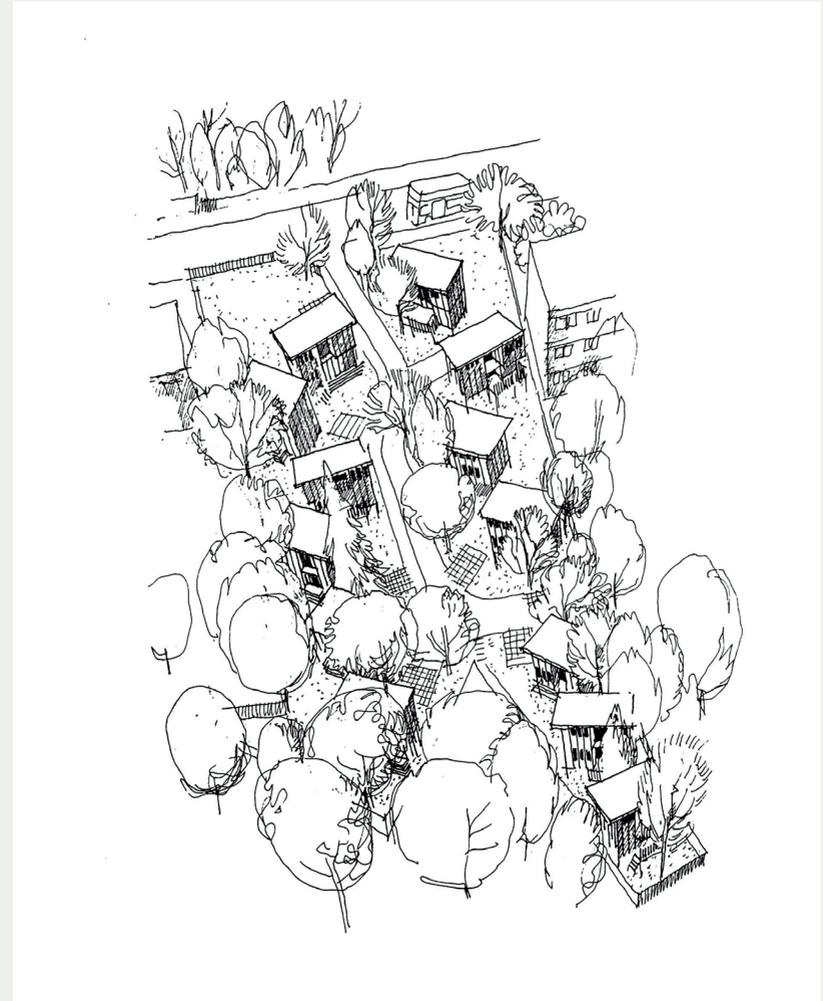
Aerial Sketch Of Walters Way By Brian Richardson
